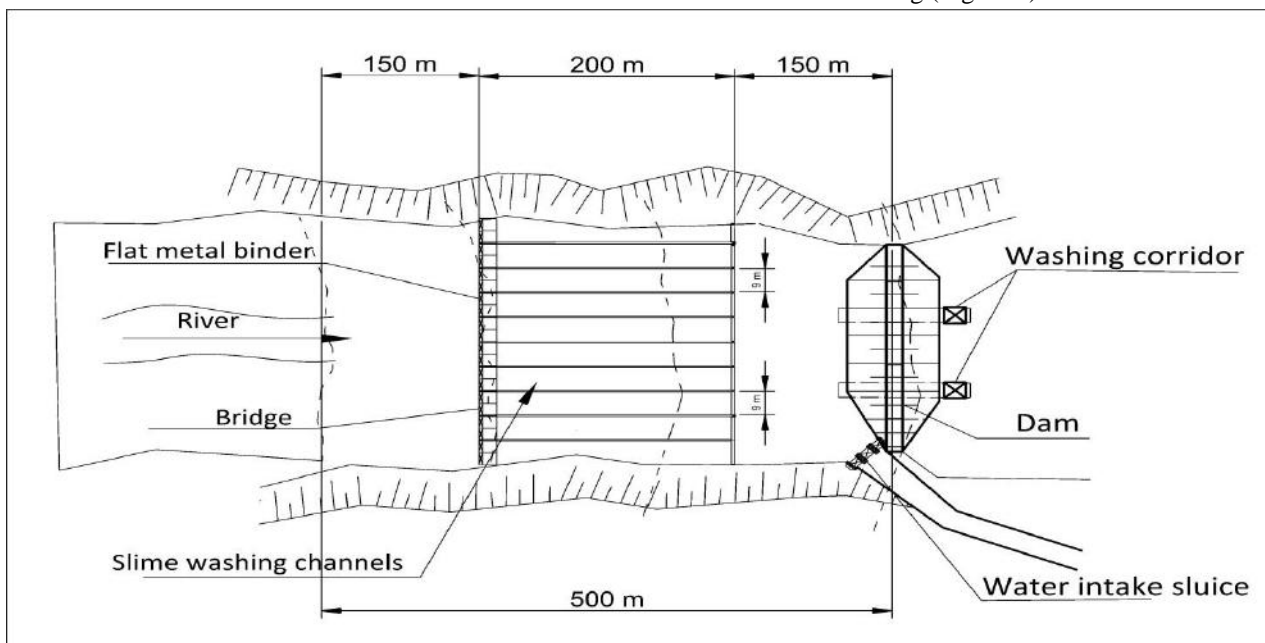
Layout scheme of slime washing channels in the water intake reservoir.
